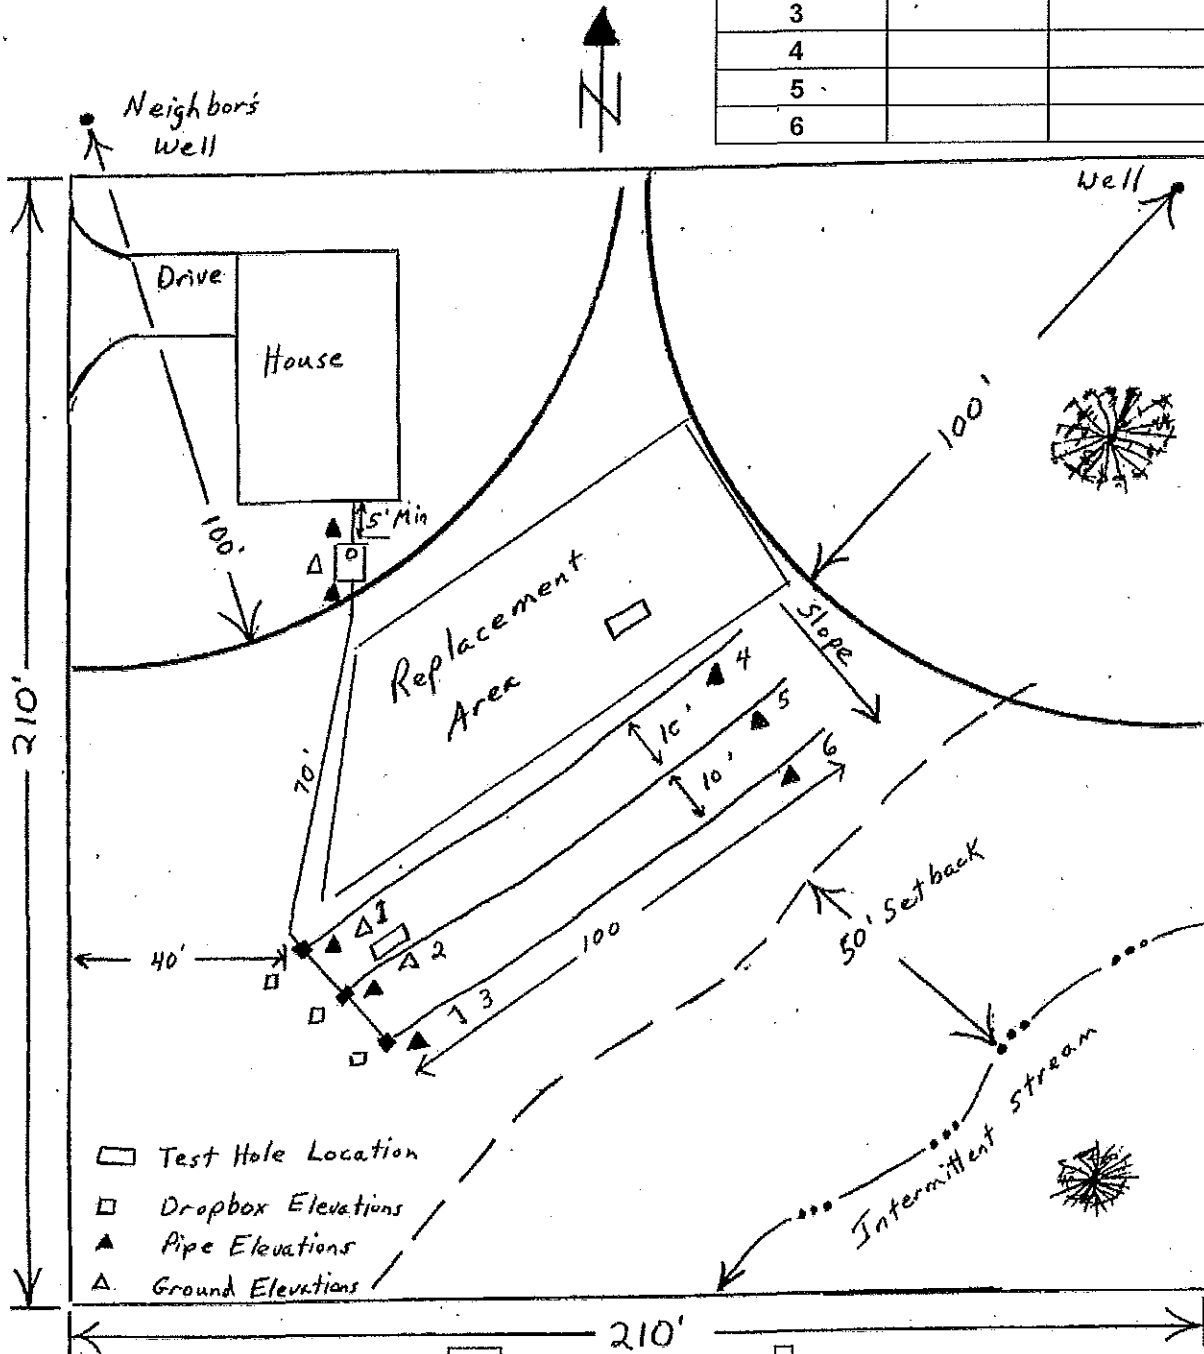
# DETAILED CONSTRUCTION/INSTALLATION PLAN
